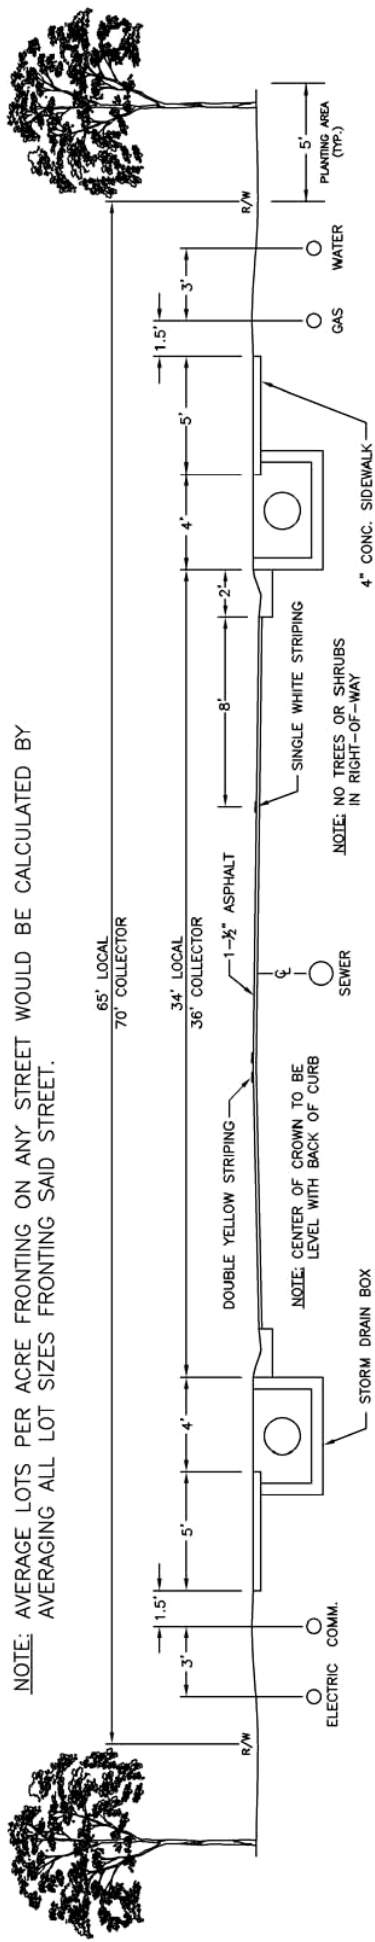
(K) Residential Street Cross Sections with Curb and Gutter
